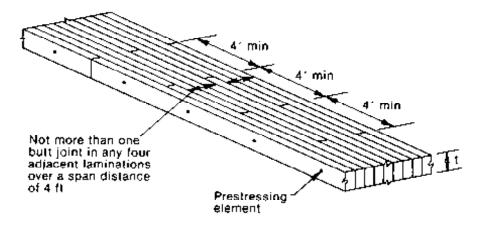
Minimum requirements for butt joints in longitudinal stress-laminated bridge decks.
